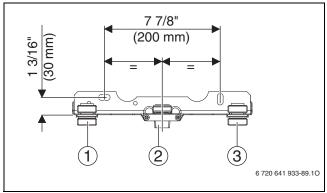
Hydraulics connection plate for heating boiler ZBR...-3A (front view)
